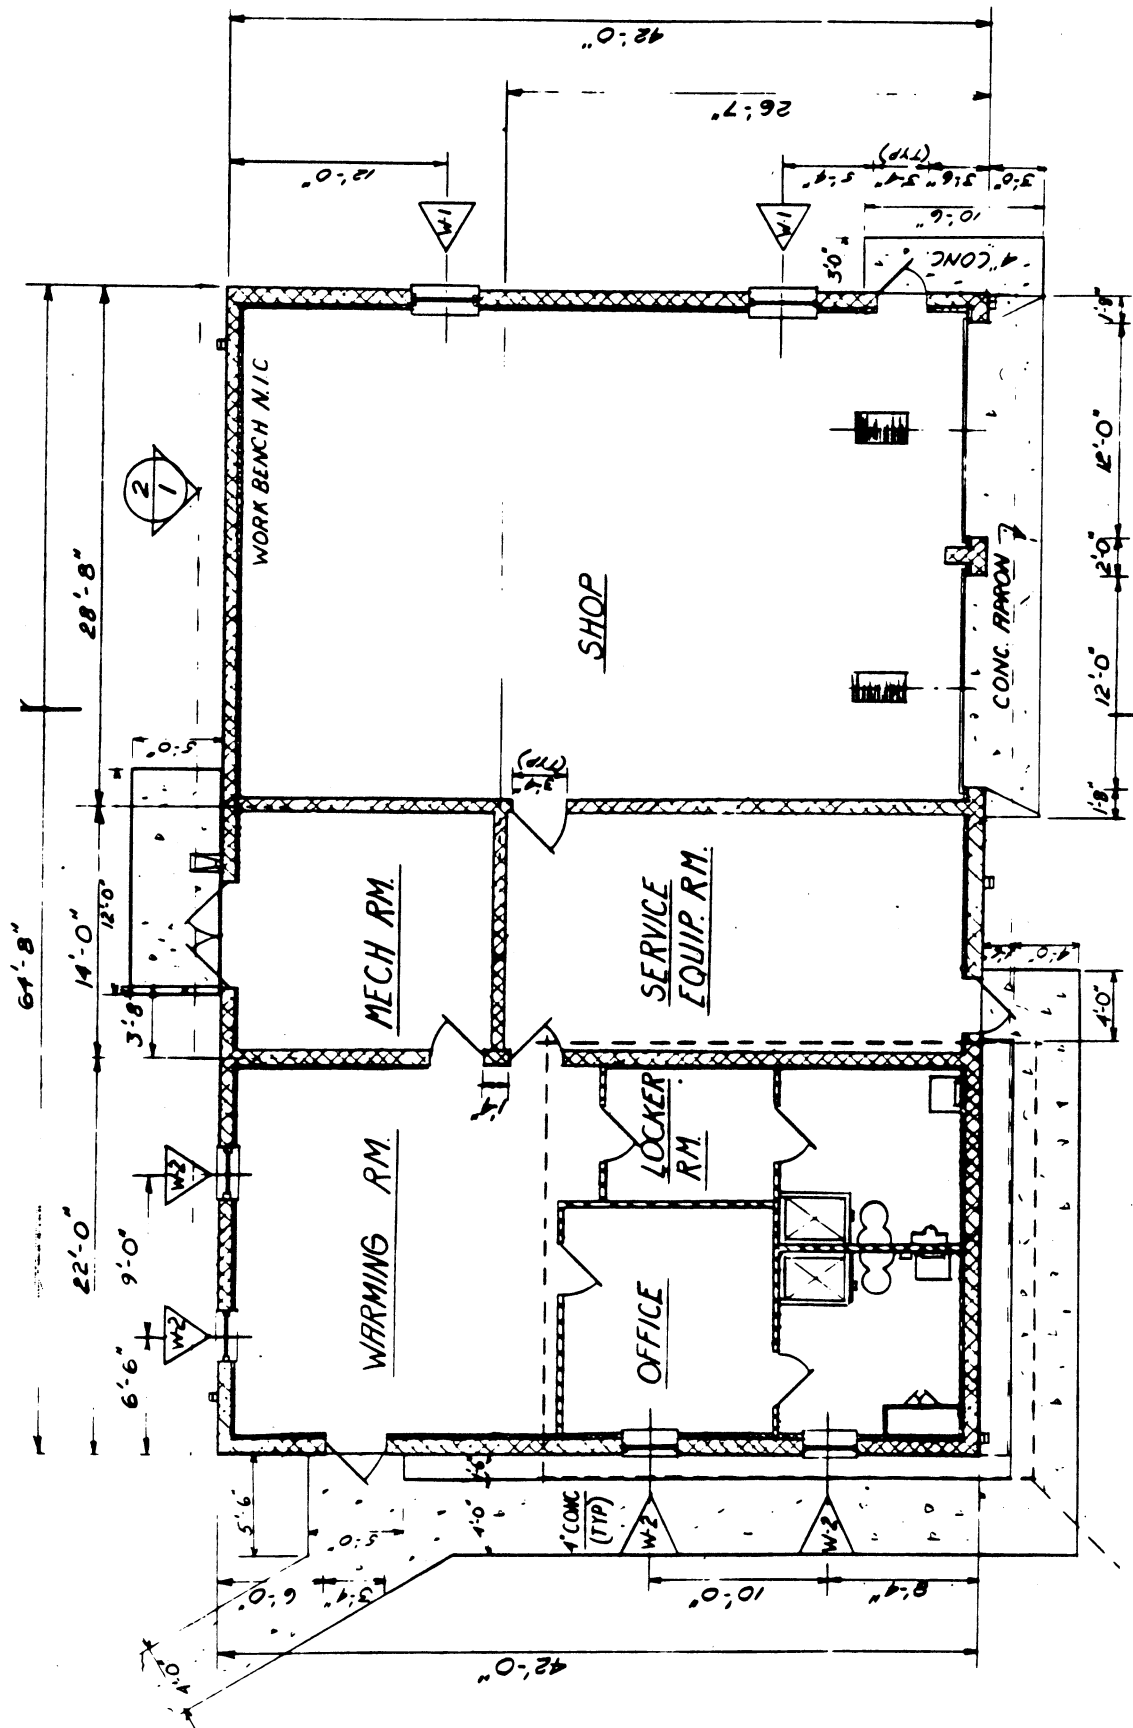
Floor plan for the solar heated maintenance area headquarters building.
